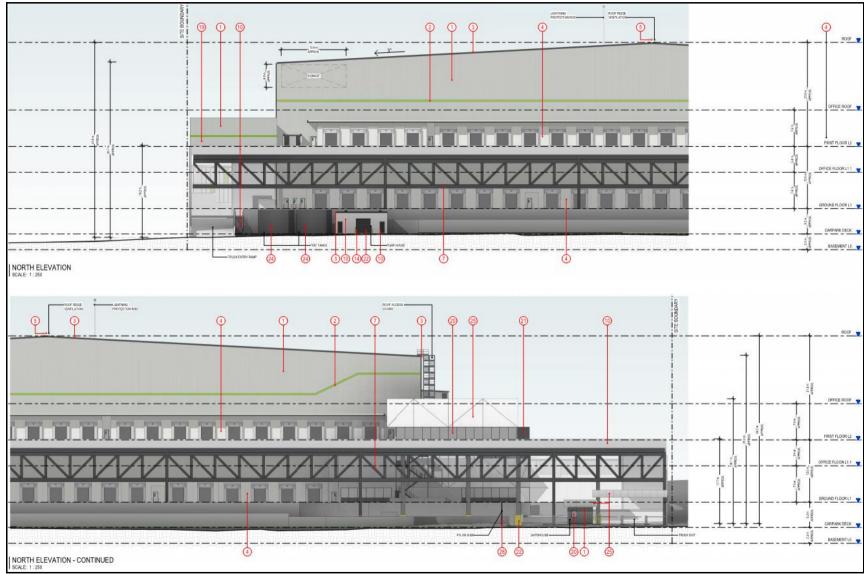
Proposed North Elevation (Watson Young Architects, 2021)
